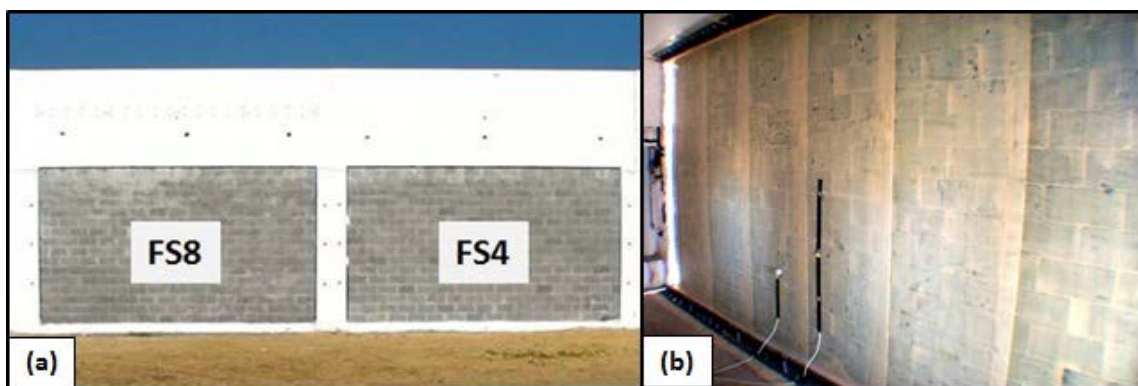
FS4 and FS8. (a) Pretest exterior view. (b) Pretest interior view of Wall FS8.
